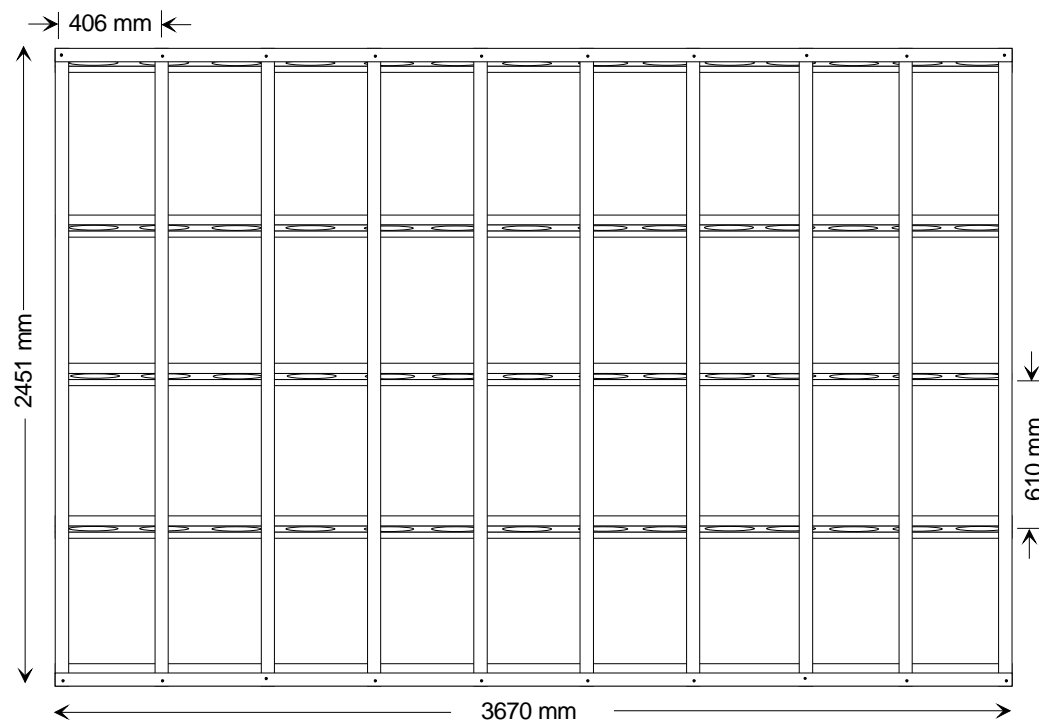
Sketch showing the construction of the load-bearing steel framing assembly with studs spaced 406 mm o.c., and resilient channels spaced 610 mm o.c. Other construction elements are unchanged from Figure A-1.
